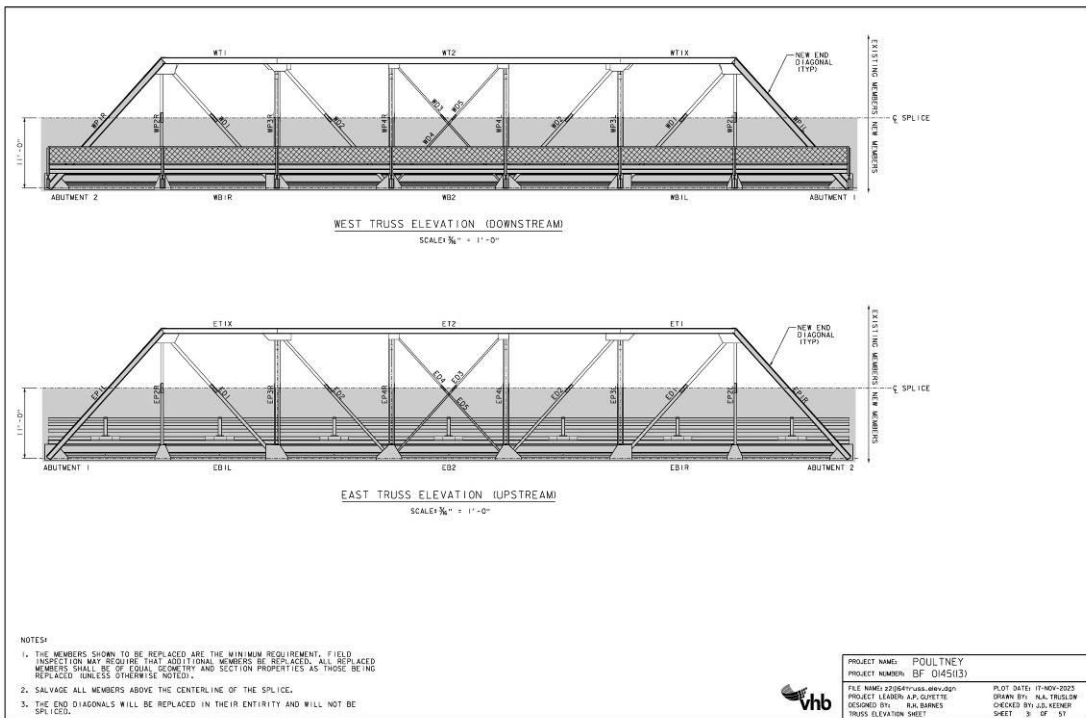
Truss Elevation Sheet, Sheet 31 of 57. Preliminary Plans, November 2023.
